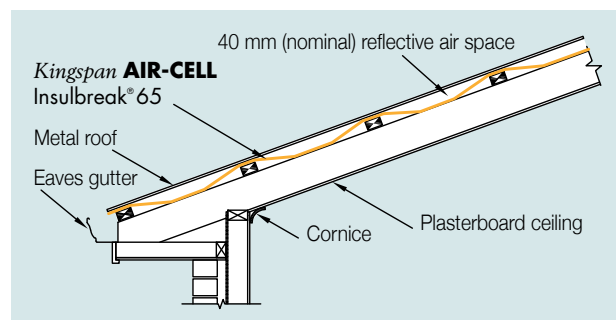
Side elevation of Kingspan AIR-CELL Insulbreak® 65 in a metal roof with a raked ceiling
